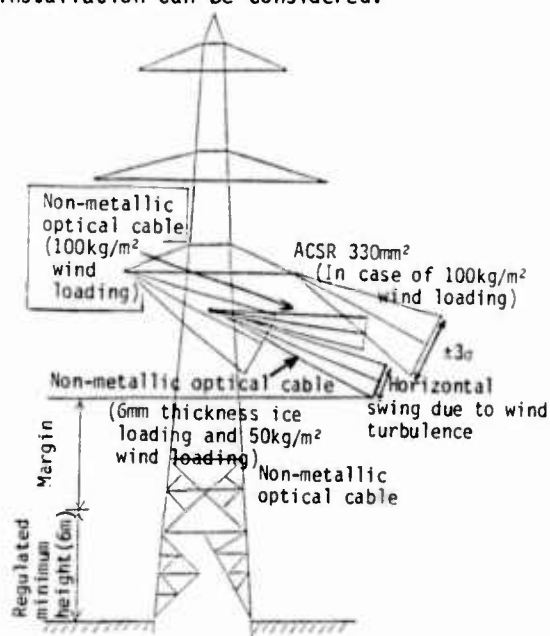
Installation location of non-metallic optical cable to steel pylon
